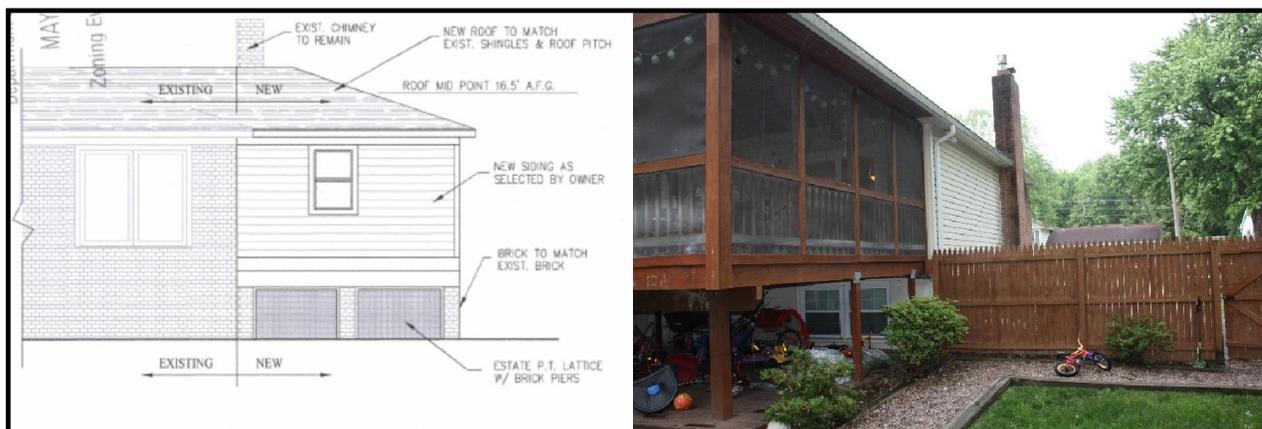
Rear view of proposed addition with existing view on right. Source: Applicant.
